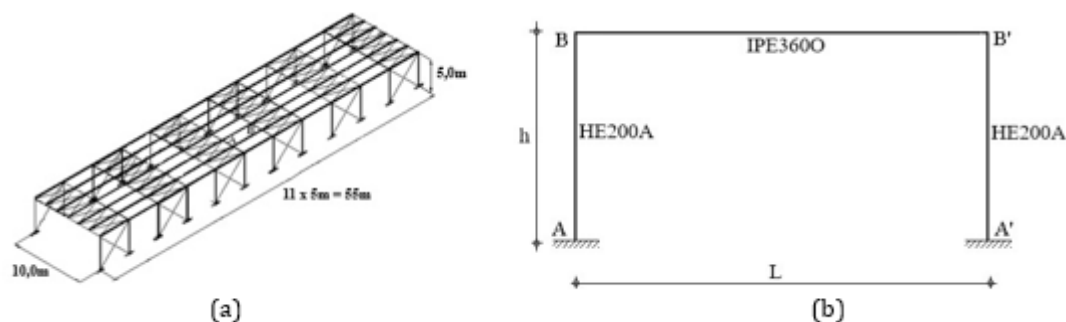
a) Steel structural industrial building, b) Steel portal frame.
